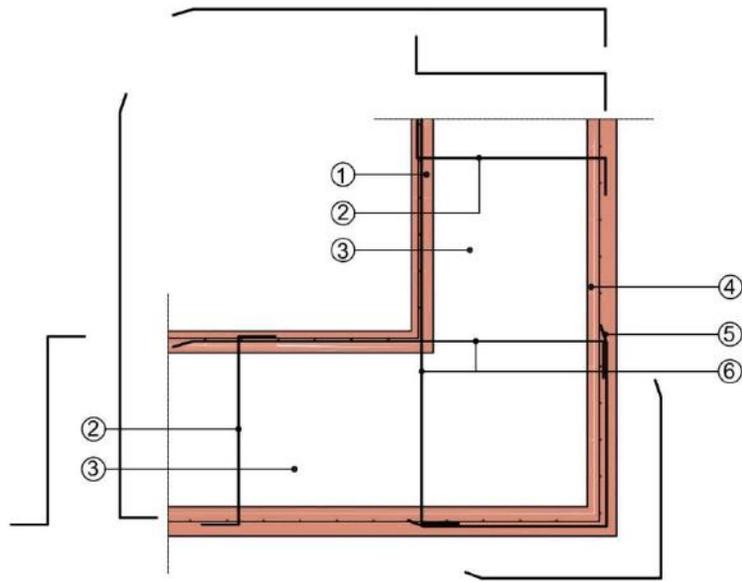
RC jacketing of masonry walls at L-junctions: 1) $\text{Ø}10$ 200x200 mm wire mesh and 80 mm thick internal RC jacketing; 2) 4 $\text{Ø}12$ through-wall steel bar ($\text{Ø}16$ hole filled with cement mortar); 3) existing masonry wall; 4) $\text{Ø}10$ 200x200 mm wire mesh and 80 mm thick external RC jacketing; 5) $\text{Ø}12$ steel bars at the corner at 500 mm spacing horizontally and vertically, and 6) $\text{Ø}12$ steel bars at 500 mm spacing.
